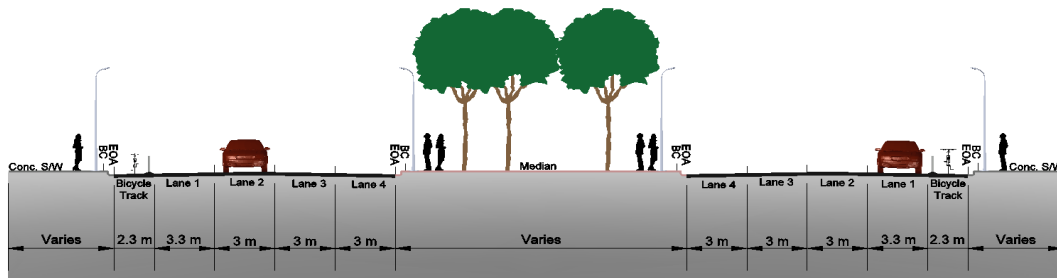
Detailed Cross Section of Separated One-Way Cycle Track
